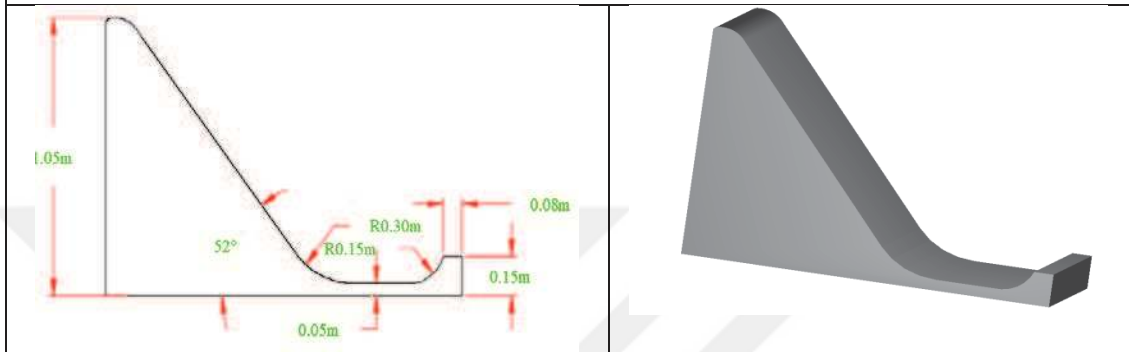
Geometric Dimensions of Case B, C, D And E
